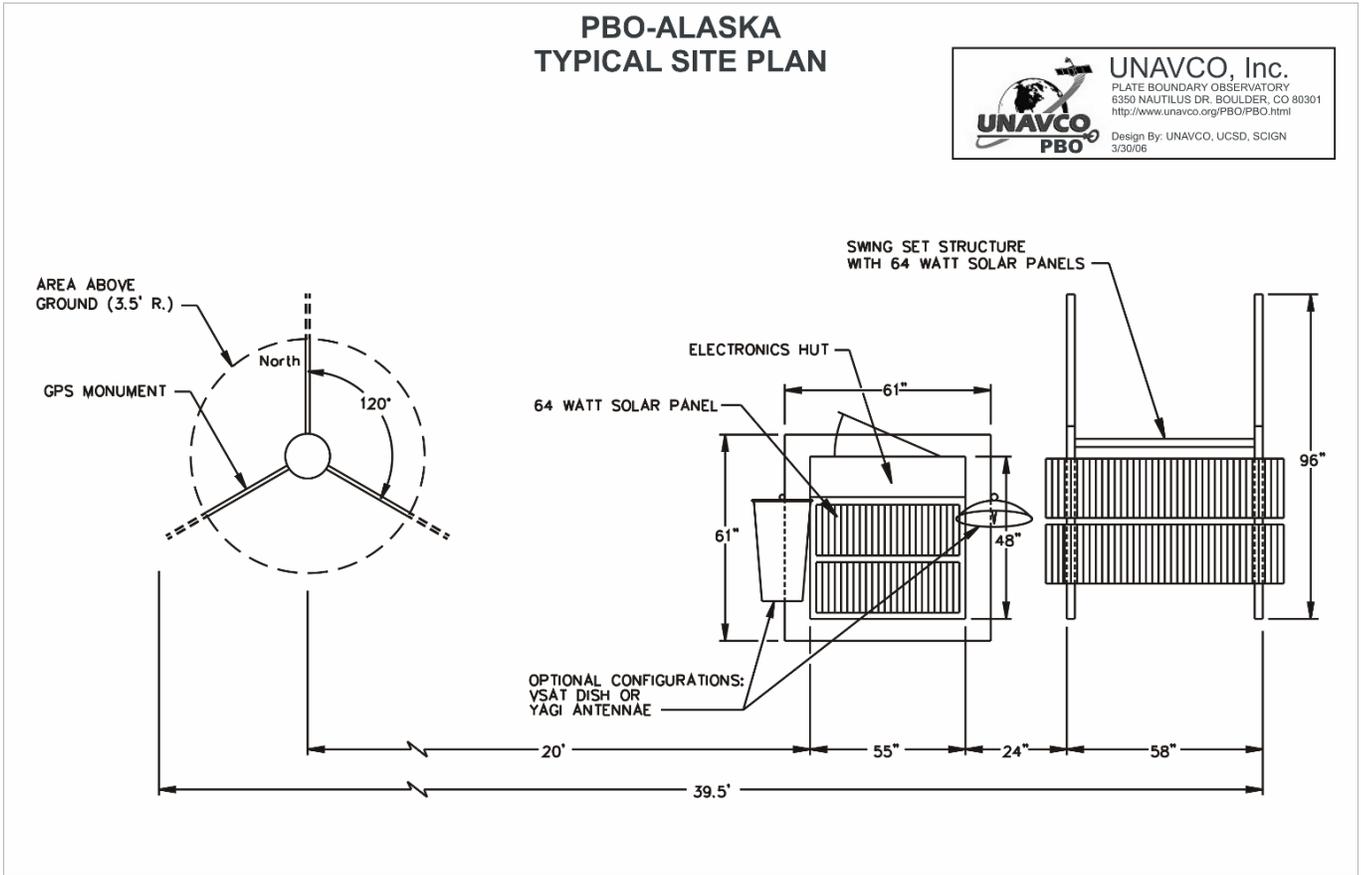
Typical plan view of a short drill-braced monument, equipment enclosure and solar panel support structure
